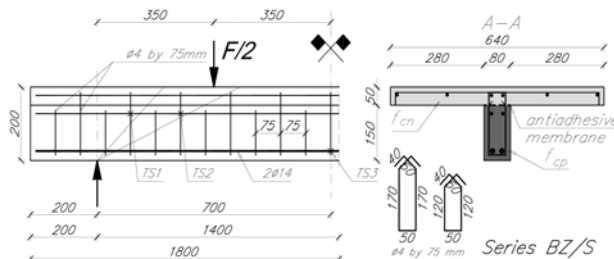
Details of tested beams: a) longitudinal section, b) cross-sections; TS1, TS2 – strain gauges on the stirrups, TS3 – strain gauges on the main bar
